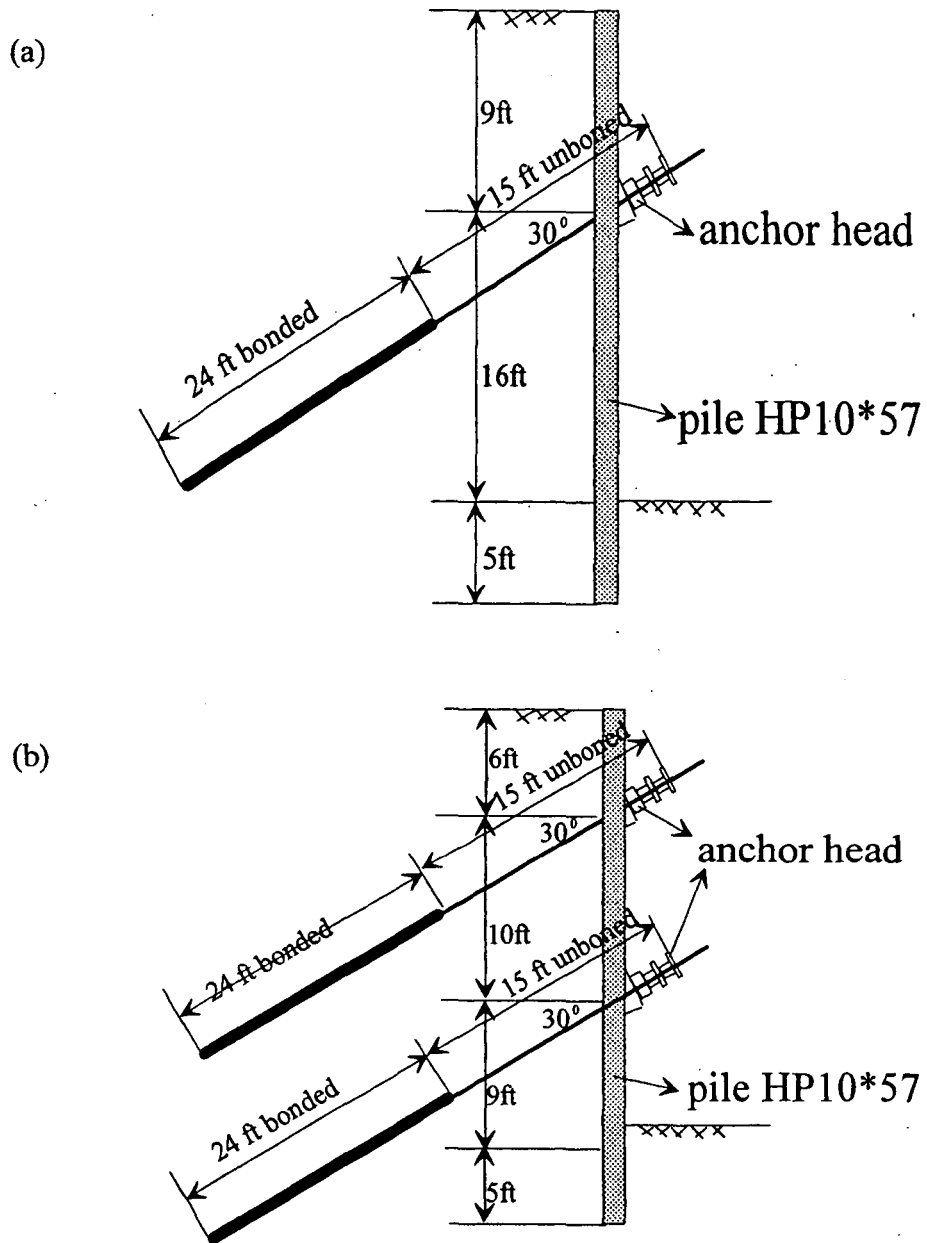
Typical cross section of the tieback wall. (Chung, M. 1991).
